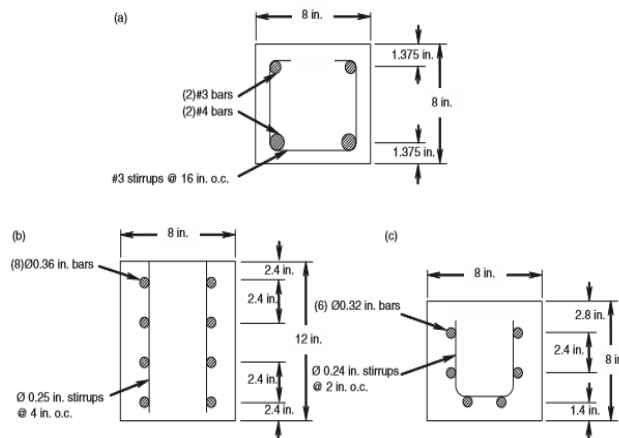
Steel reinforcement sketches of test specimen types (Memari et al., 2010)
